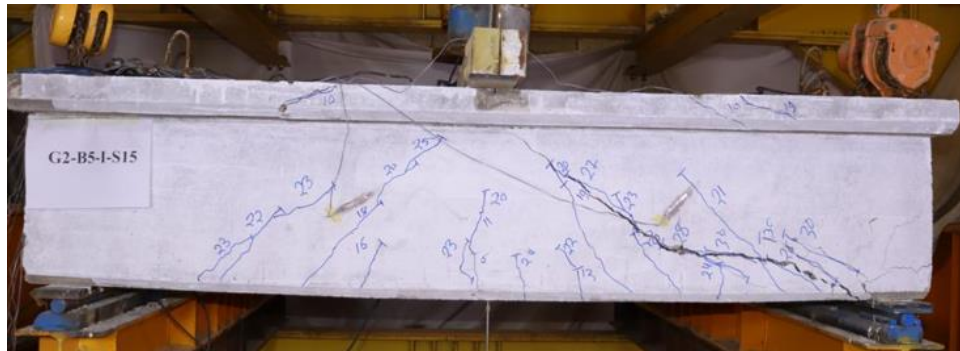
Failure crack pattern of specimen G2-B5-I-S15
